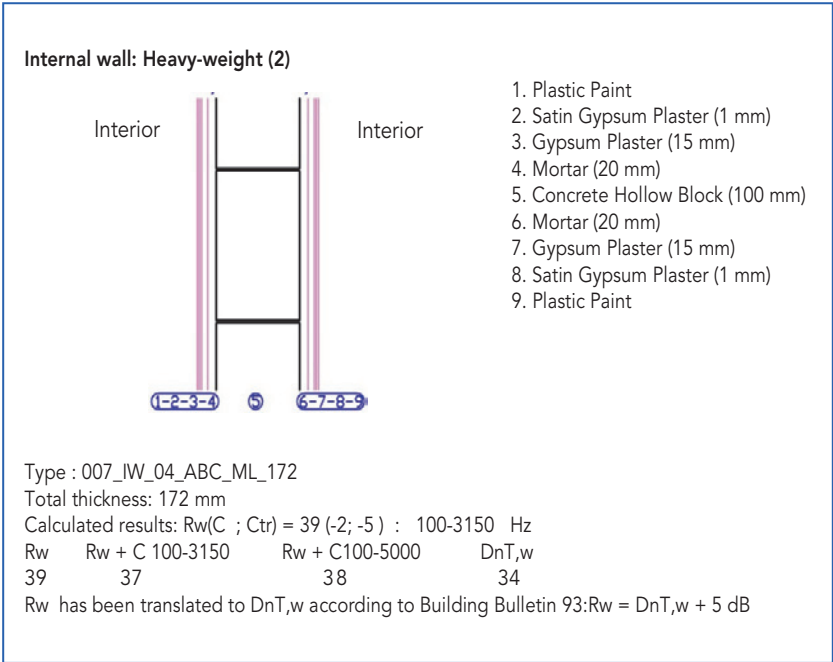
Heavy-weight wall. Construction details and sound insulation data.
